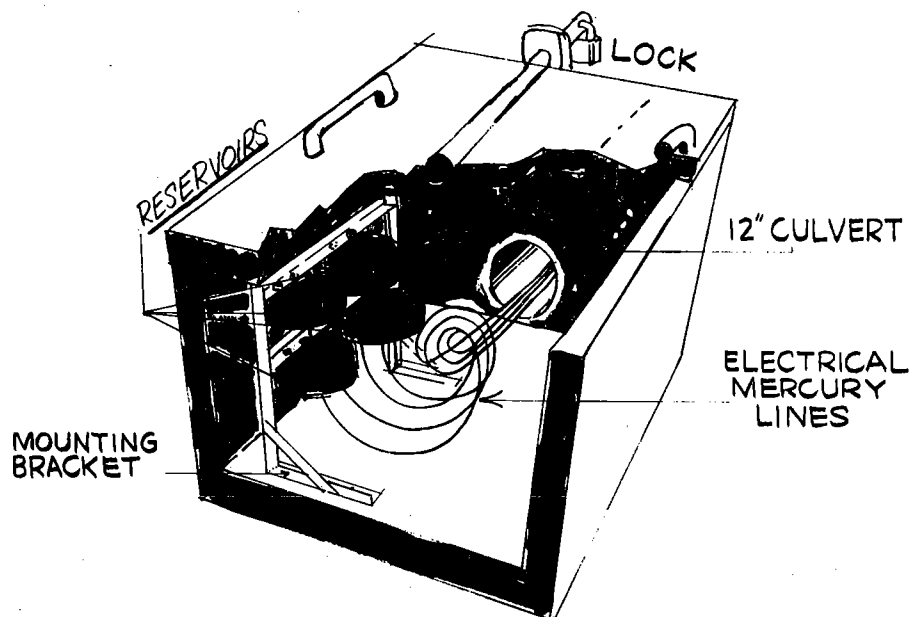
Example of the two reservoir station boxes remote from the instrument house.
